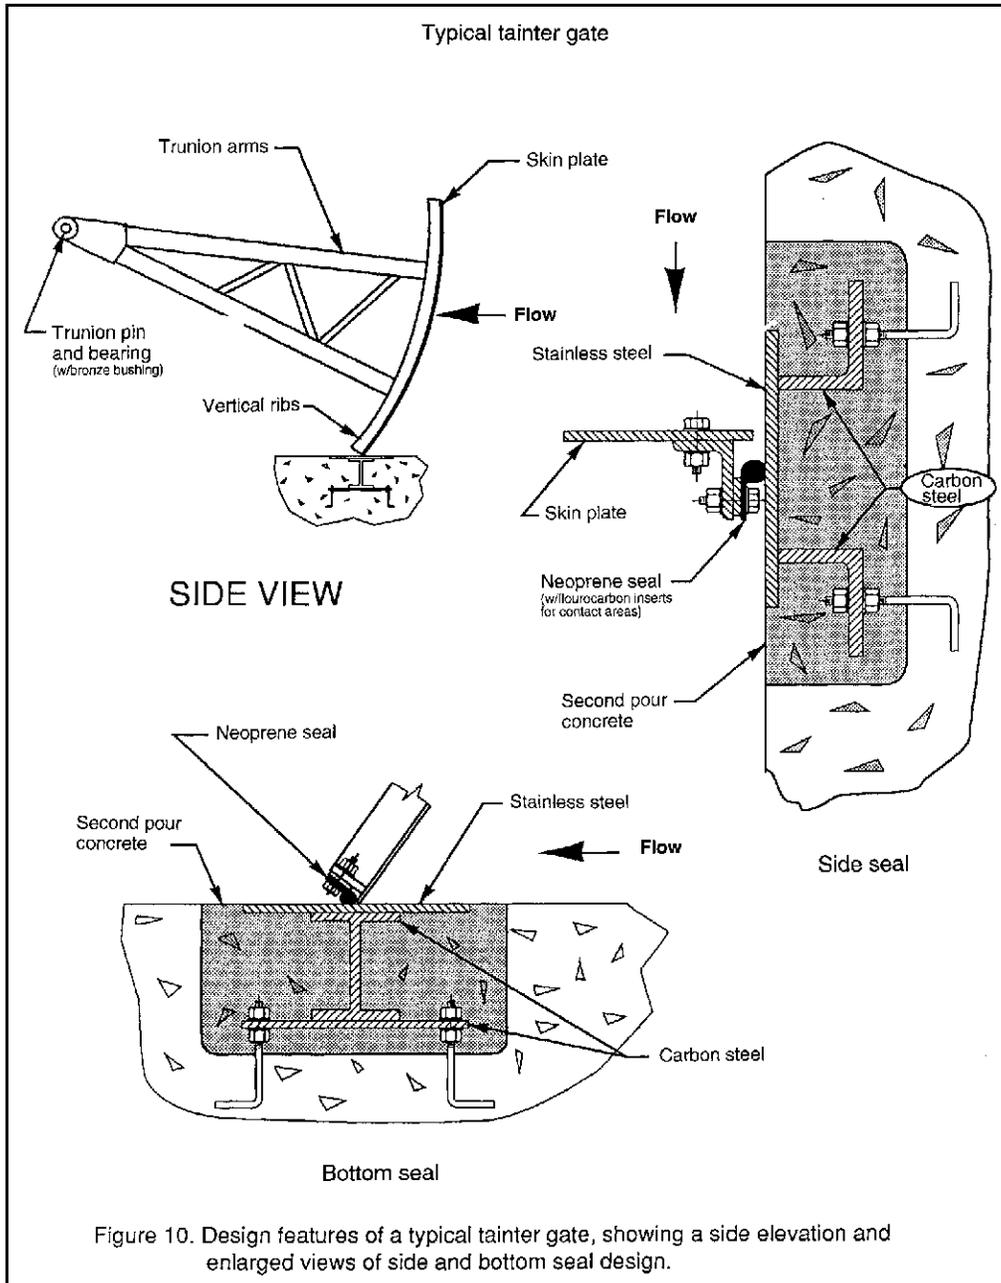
Design features of a typical tainter gate, showing a side elevation and enlarged views of side and bottom seal design.
